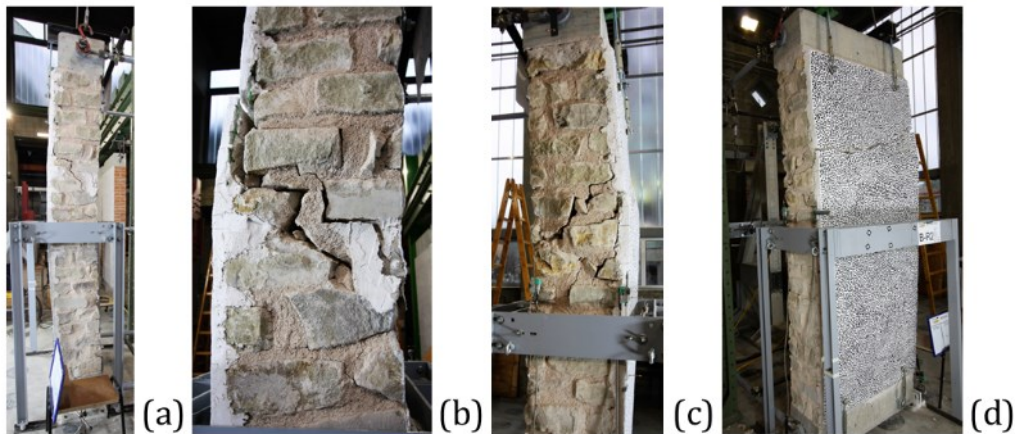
Crack pattern at $u = 55.0$ mm (a) and at the end of the test, right view (b), left view (c), front view (d)
